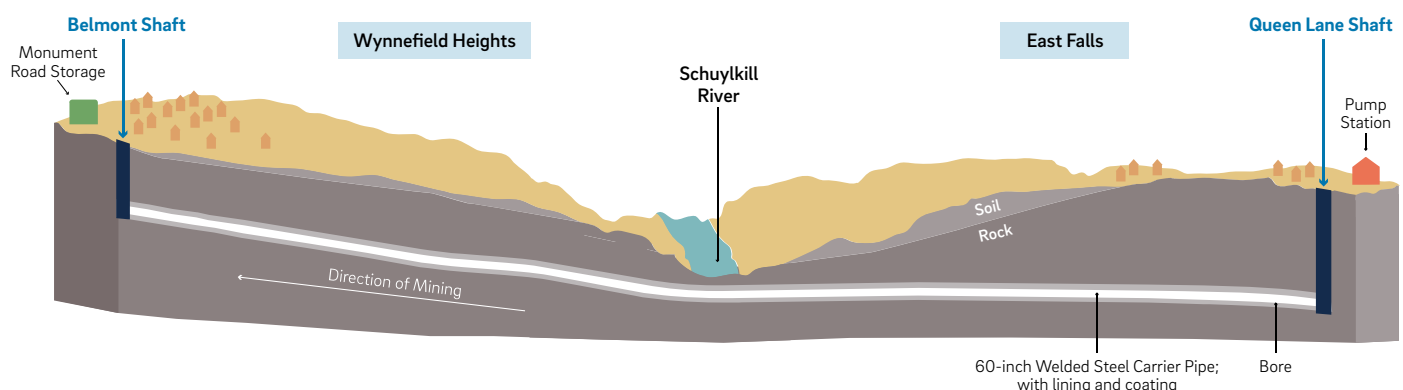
A 60-inch-diameter pipeline will be placed within the underground tunnel that connects Queen Lane and Belmont WTPs
